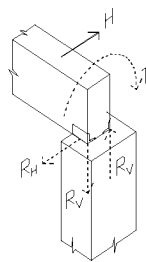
Force Balance at Connections Due to Horizontal Seismic Loading
